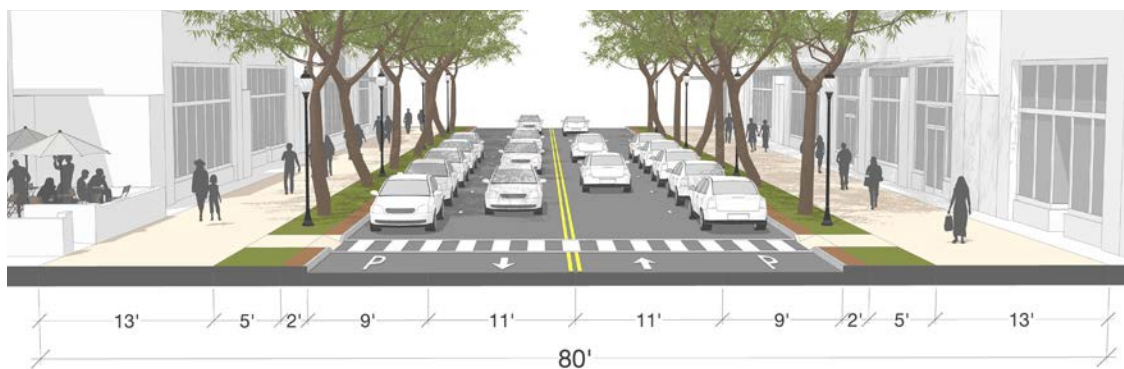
Main Street Improvements - Existing Redevelopment Plan
